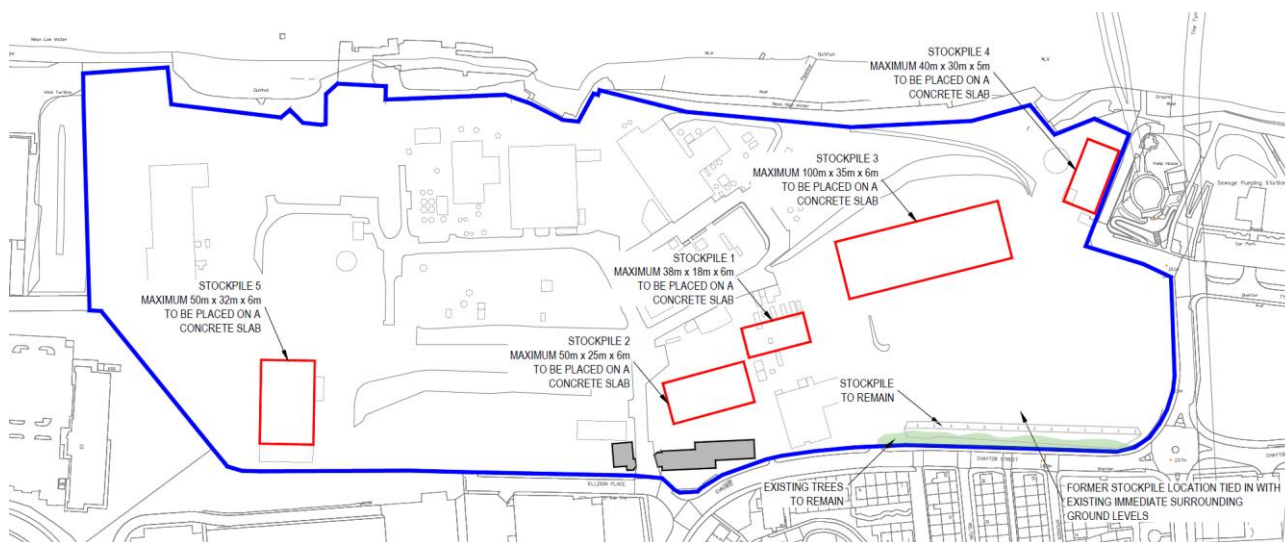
Plate A – Site Plan from 2018 planning application documents showing location of soil berm and planned position of stockpiles.
